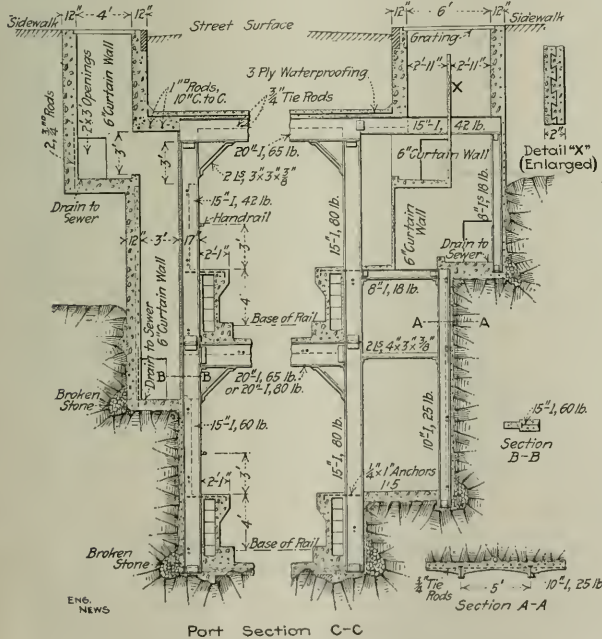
PARTIAL CROSS-SECTIONS AND PLANS OF DOUBLE-DECK SUBWAY, SHOWING TYPICAL ARRANGEMENT OF VENTILATING OUTLETS
